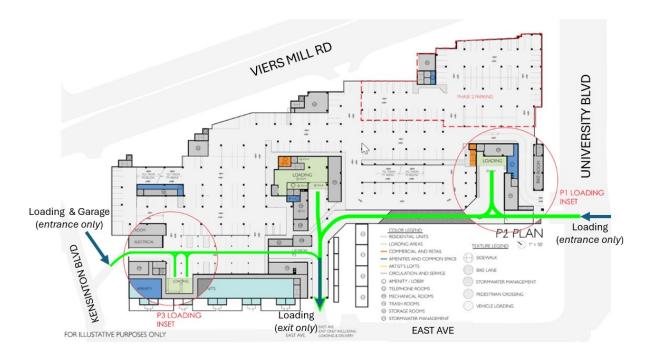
Internal Loading Circulation Pattern (via connected underground parking garage)
